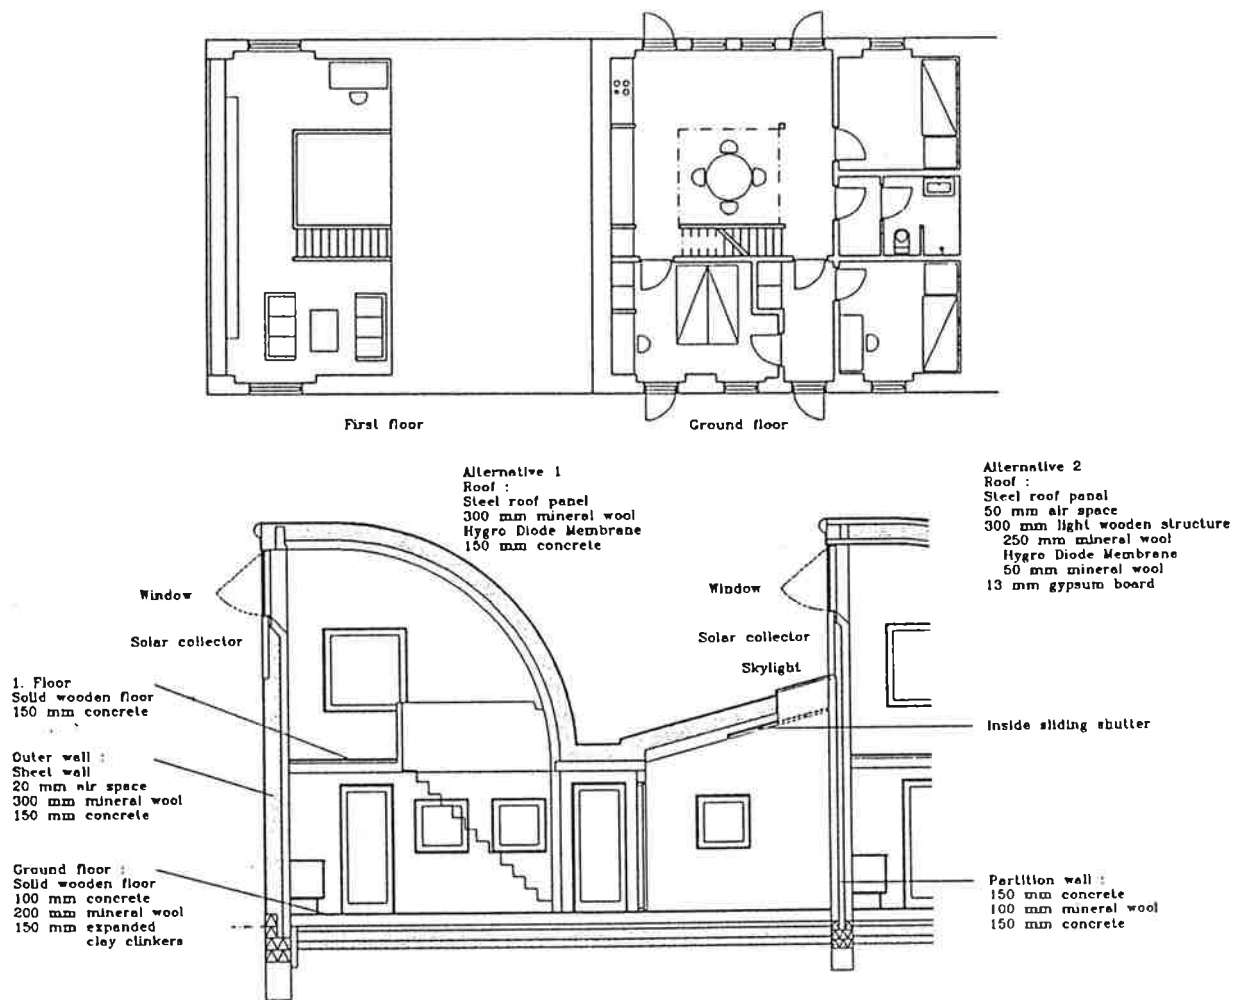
Plans and cross section of rowhouse with east/west-facing facades.
